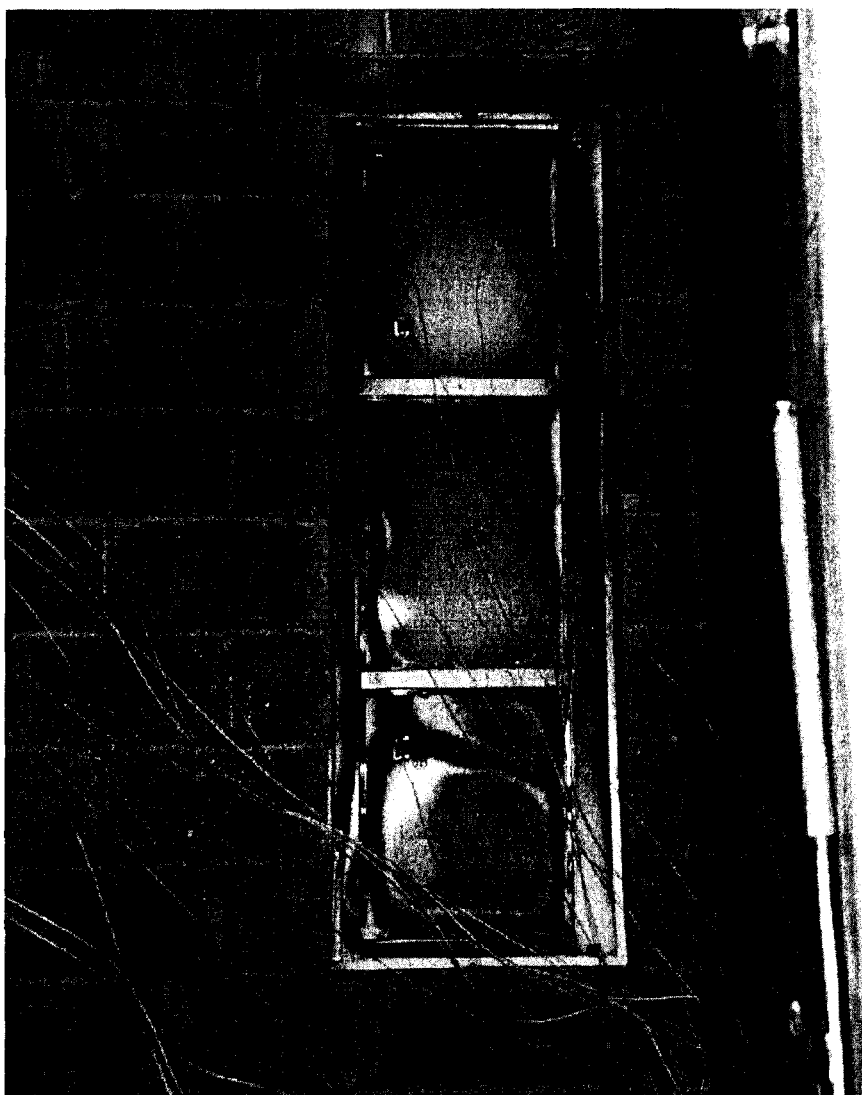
Unexposed face of access panel B at termination of test (90 minutes).
